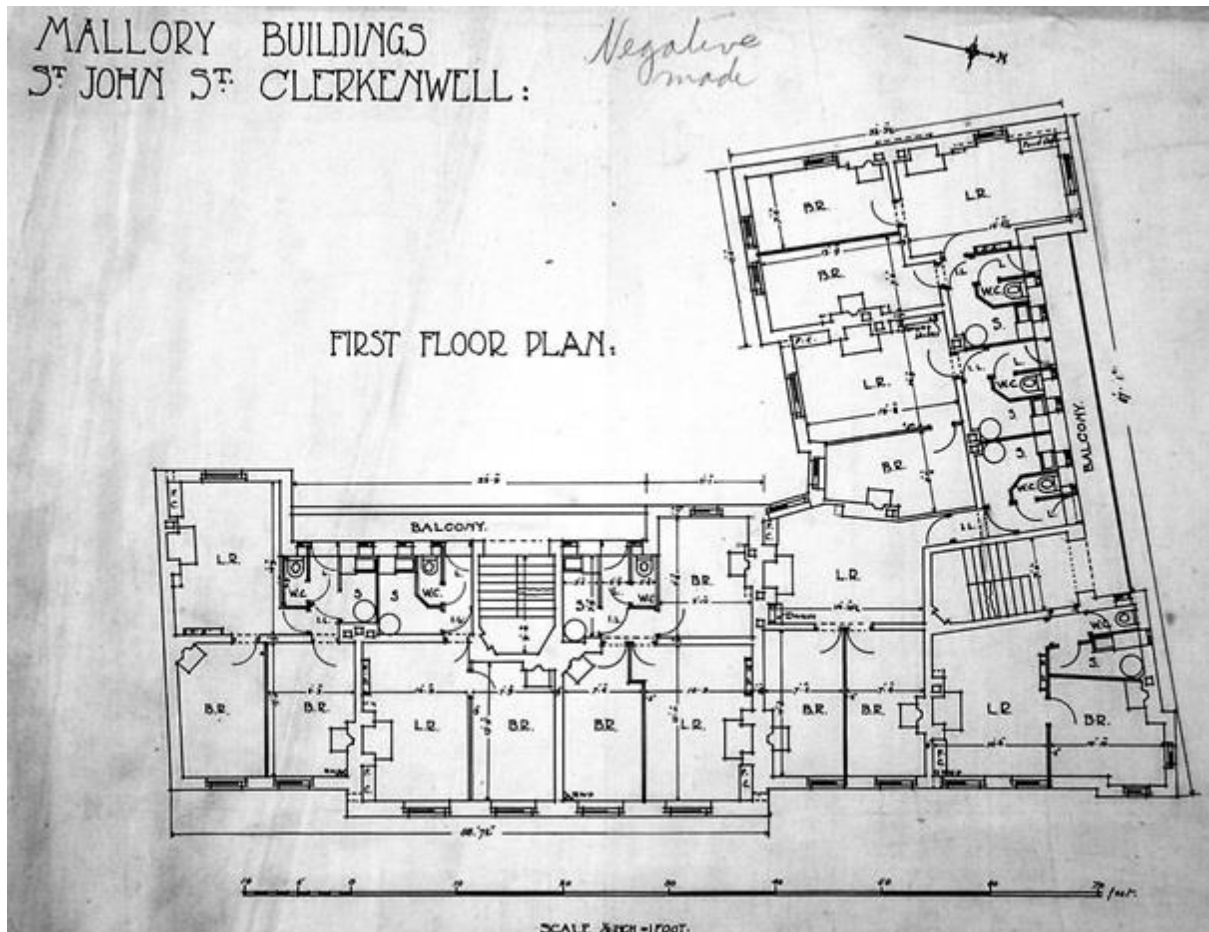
Plan of Mallory Buildings (LMA ref: LCC/AR/HS/03/057)
